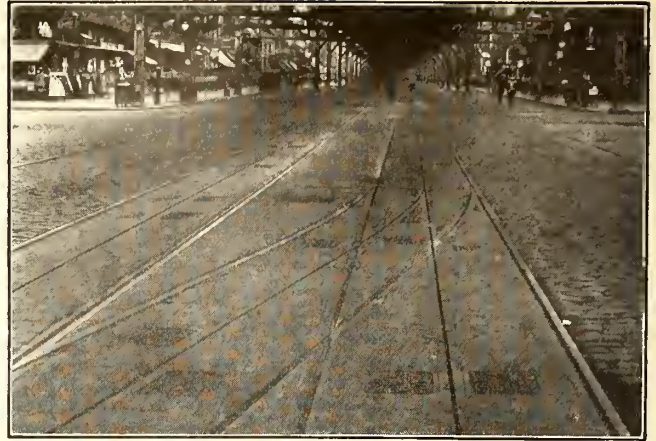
DETAILS OF NEW YORK STATE RAILWAYS SWITCH IRON
